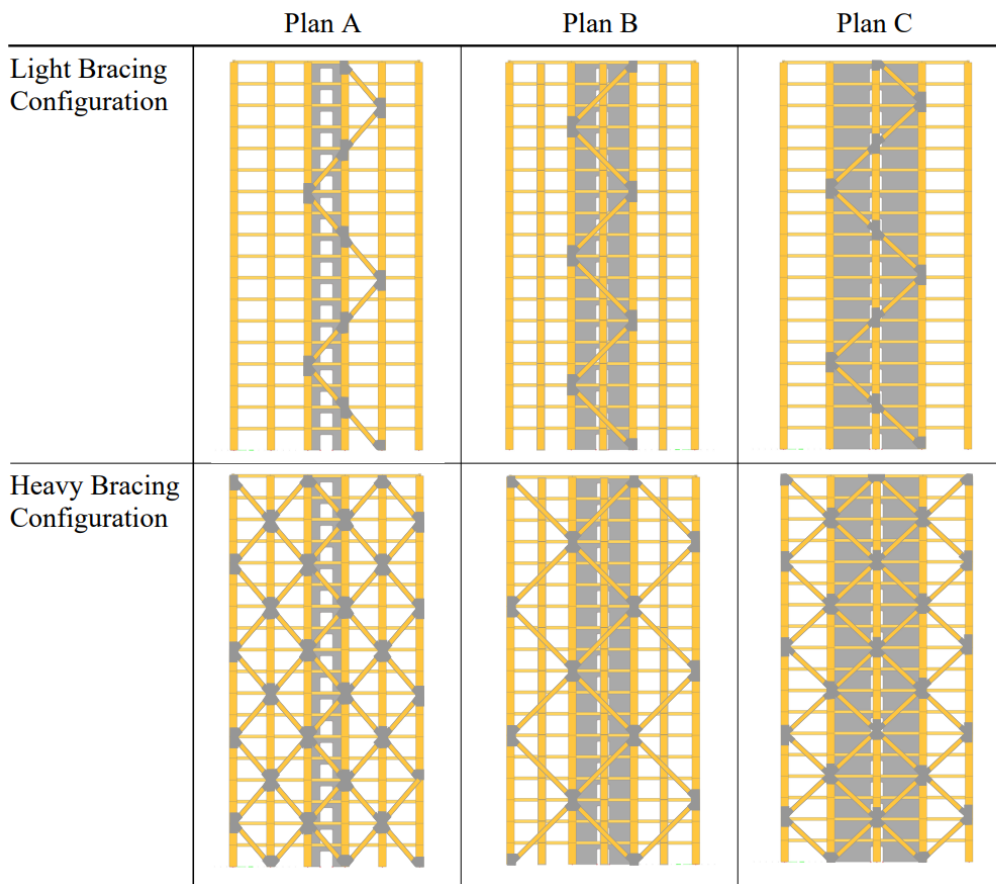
Side views of variant 1 for all floor plans with two bracing configurations each
